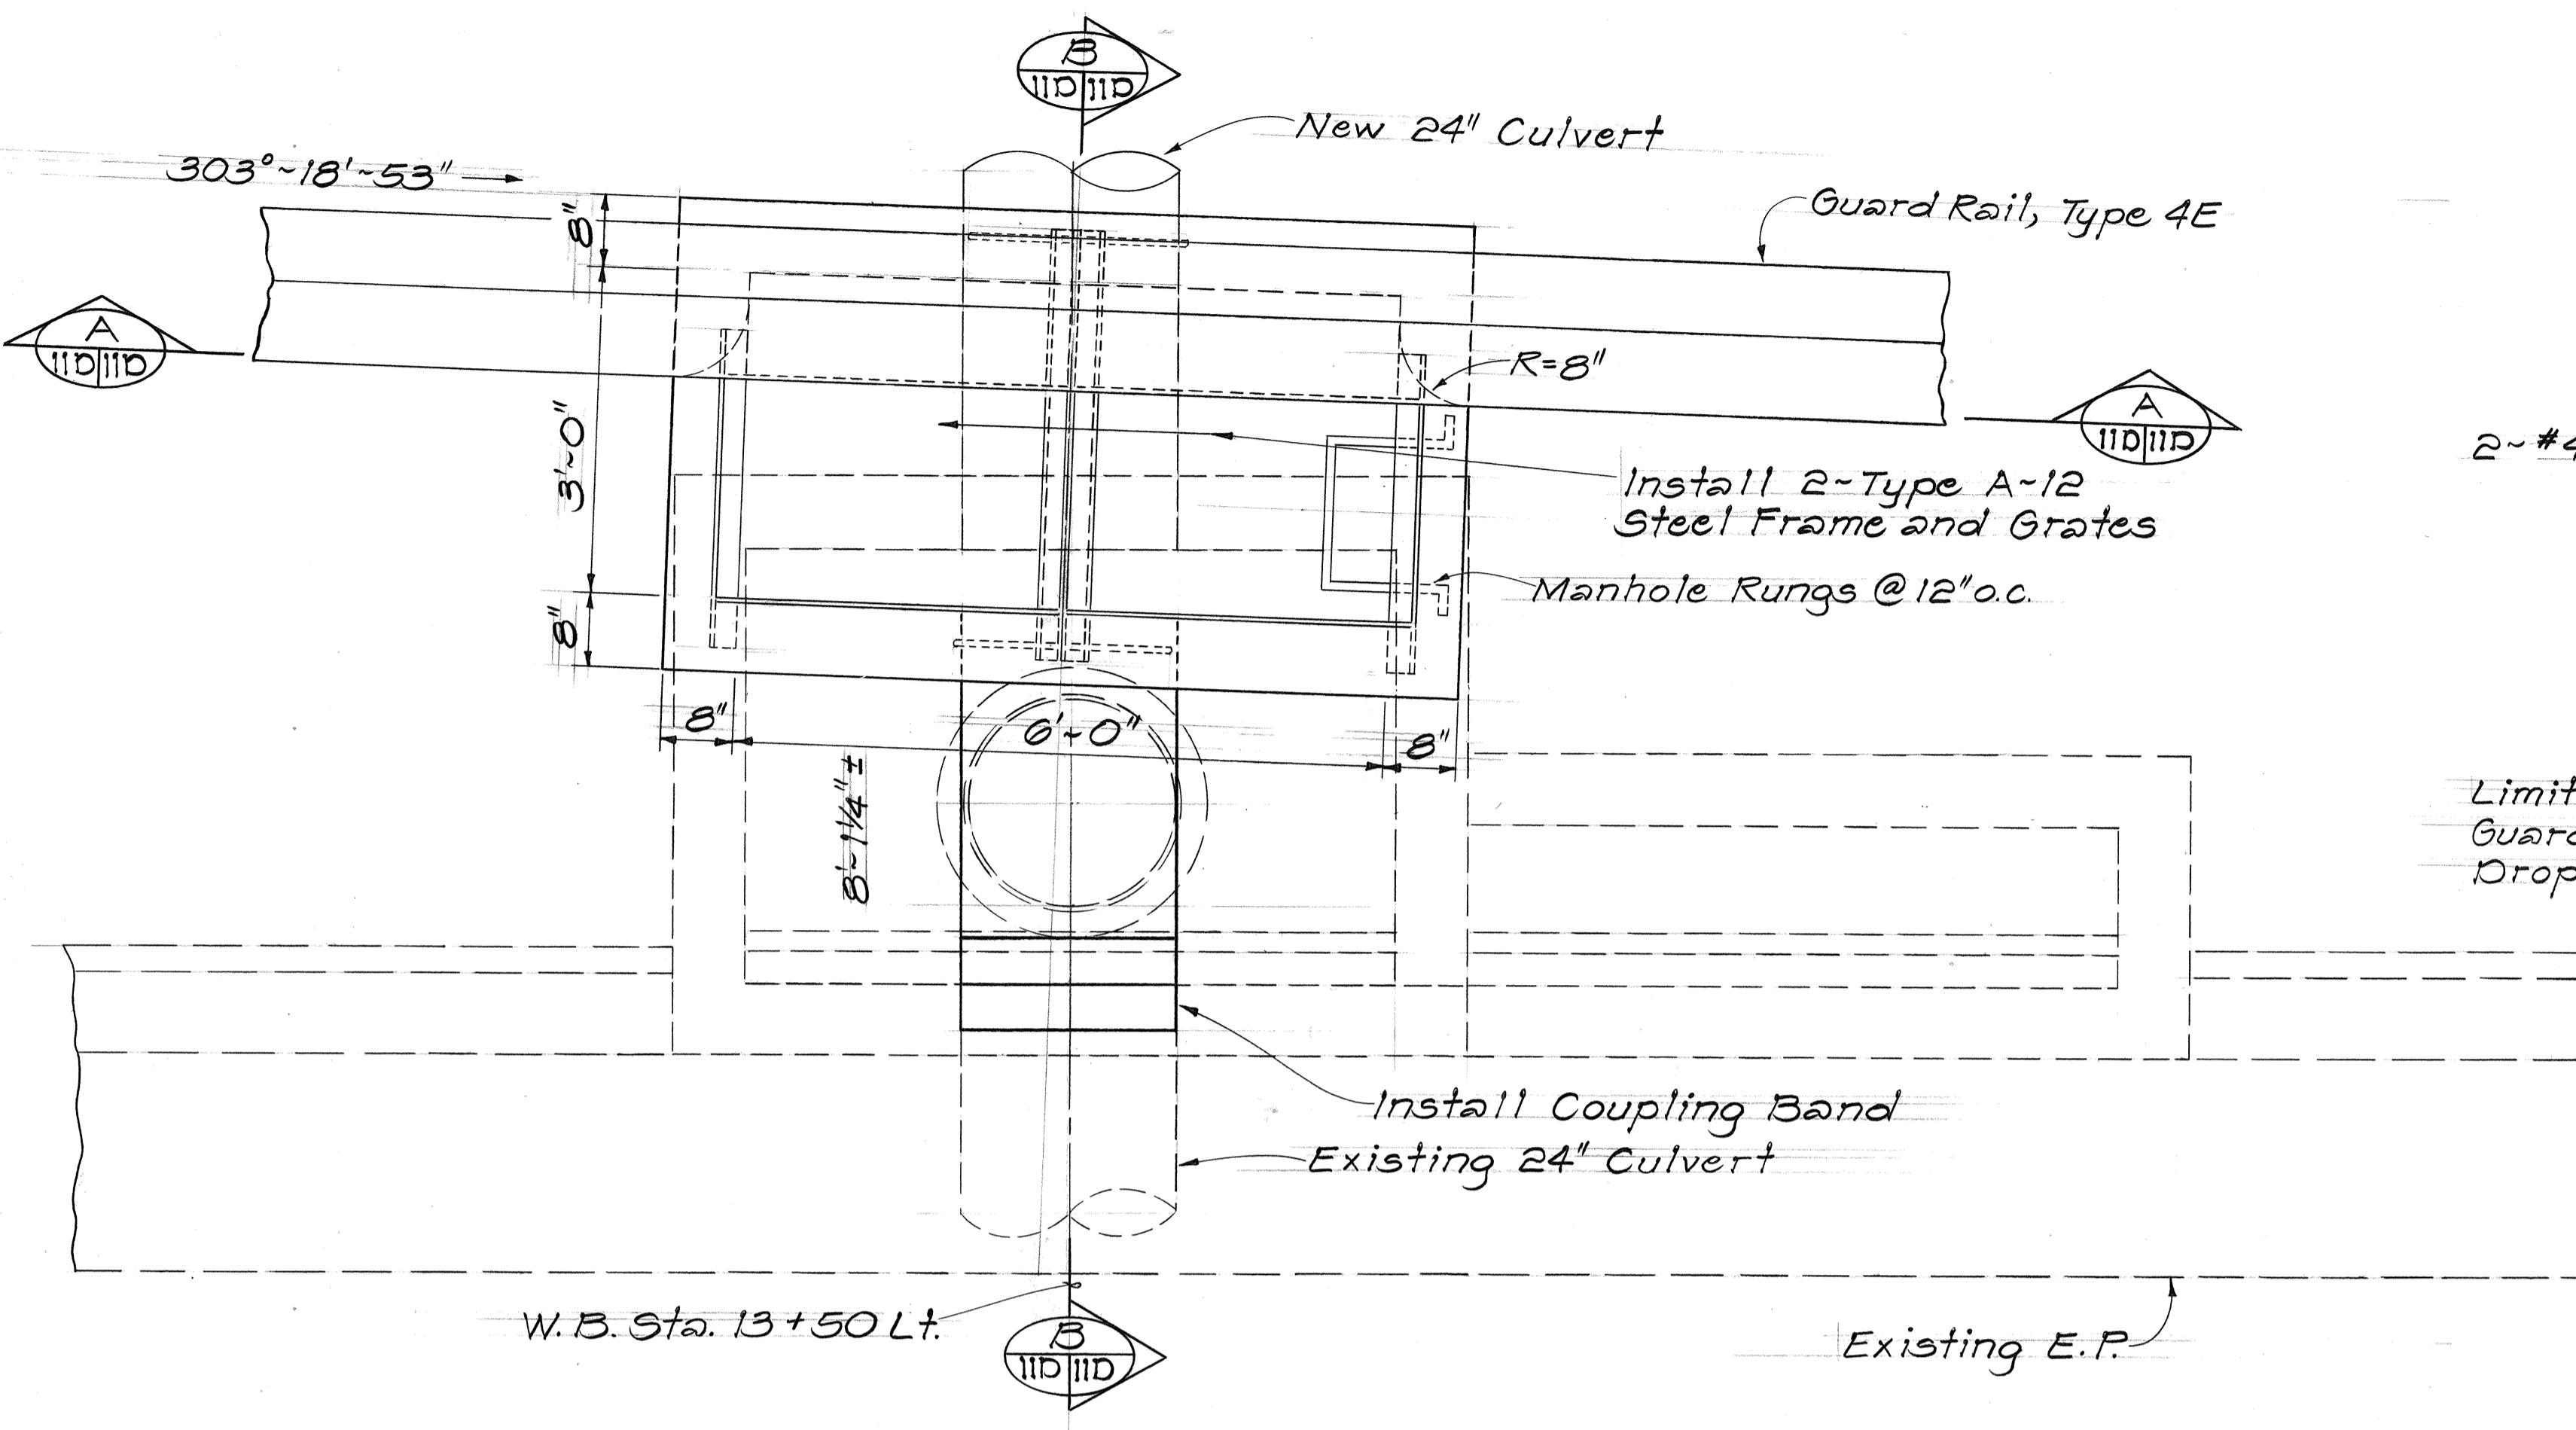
DETAILS OF RECONSTRUCTED TYPE 2/C.O. G.D.I.#17
